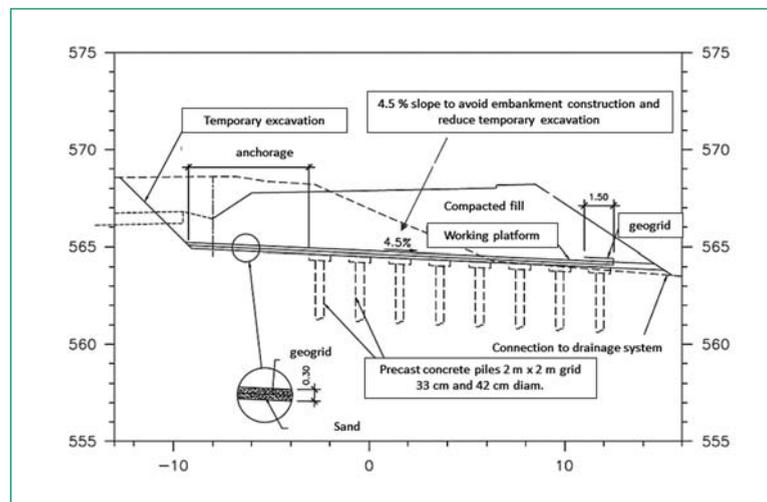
Cross-section with the designed piled embankment, including a slope of 4,5% to limit groundworks as much as possible.
